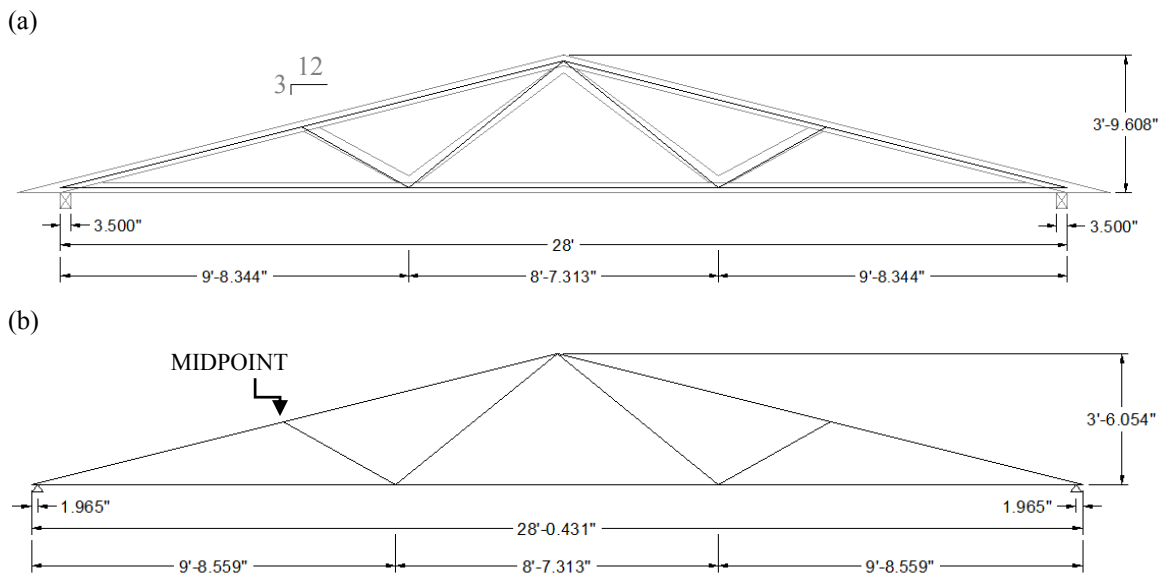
3:12 Truss Geometry – (a) Actual truss from Wolfe and LaBissoniere (1991) and (b) centerline model used in SAP2000
